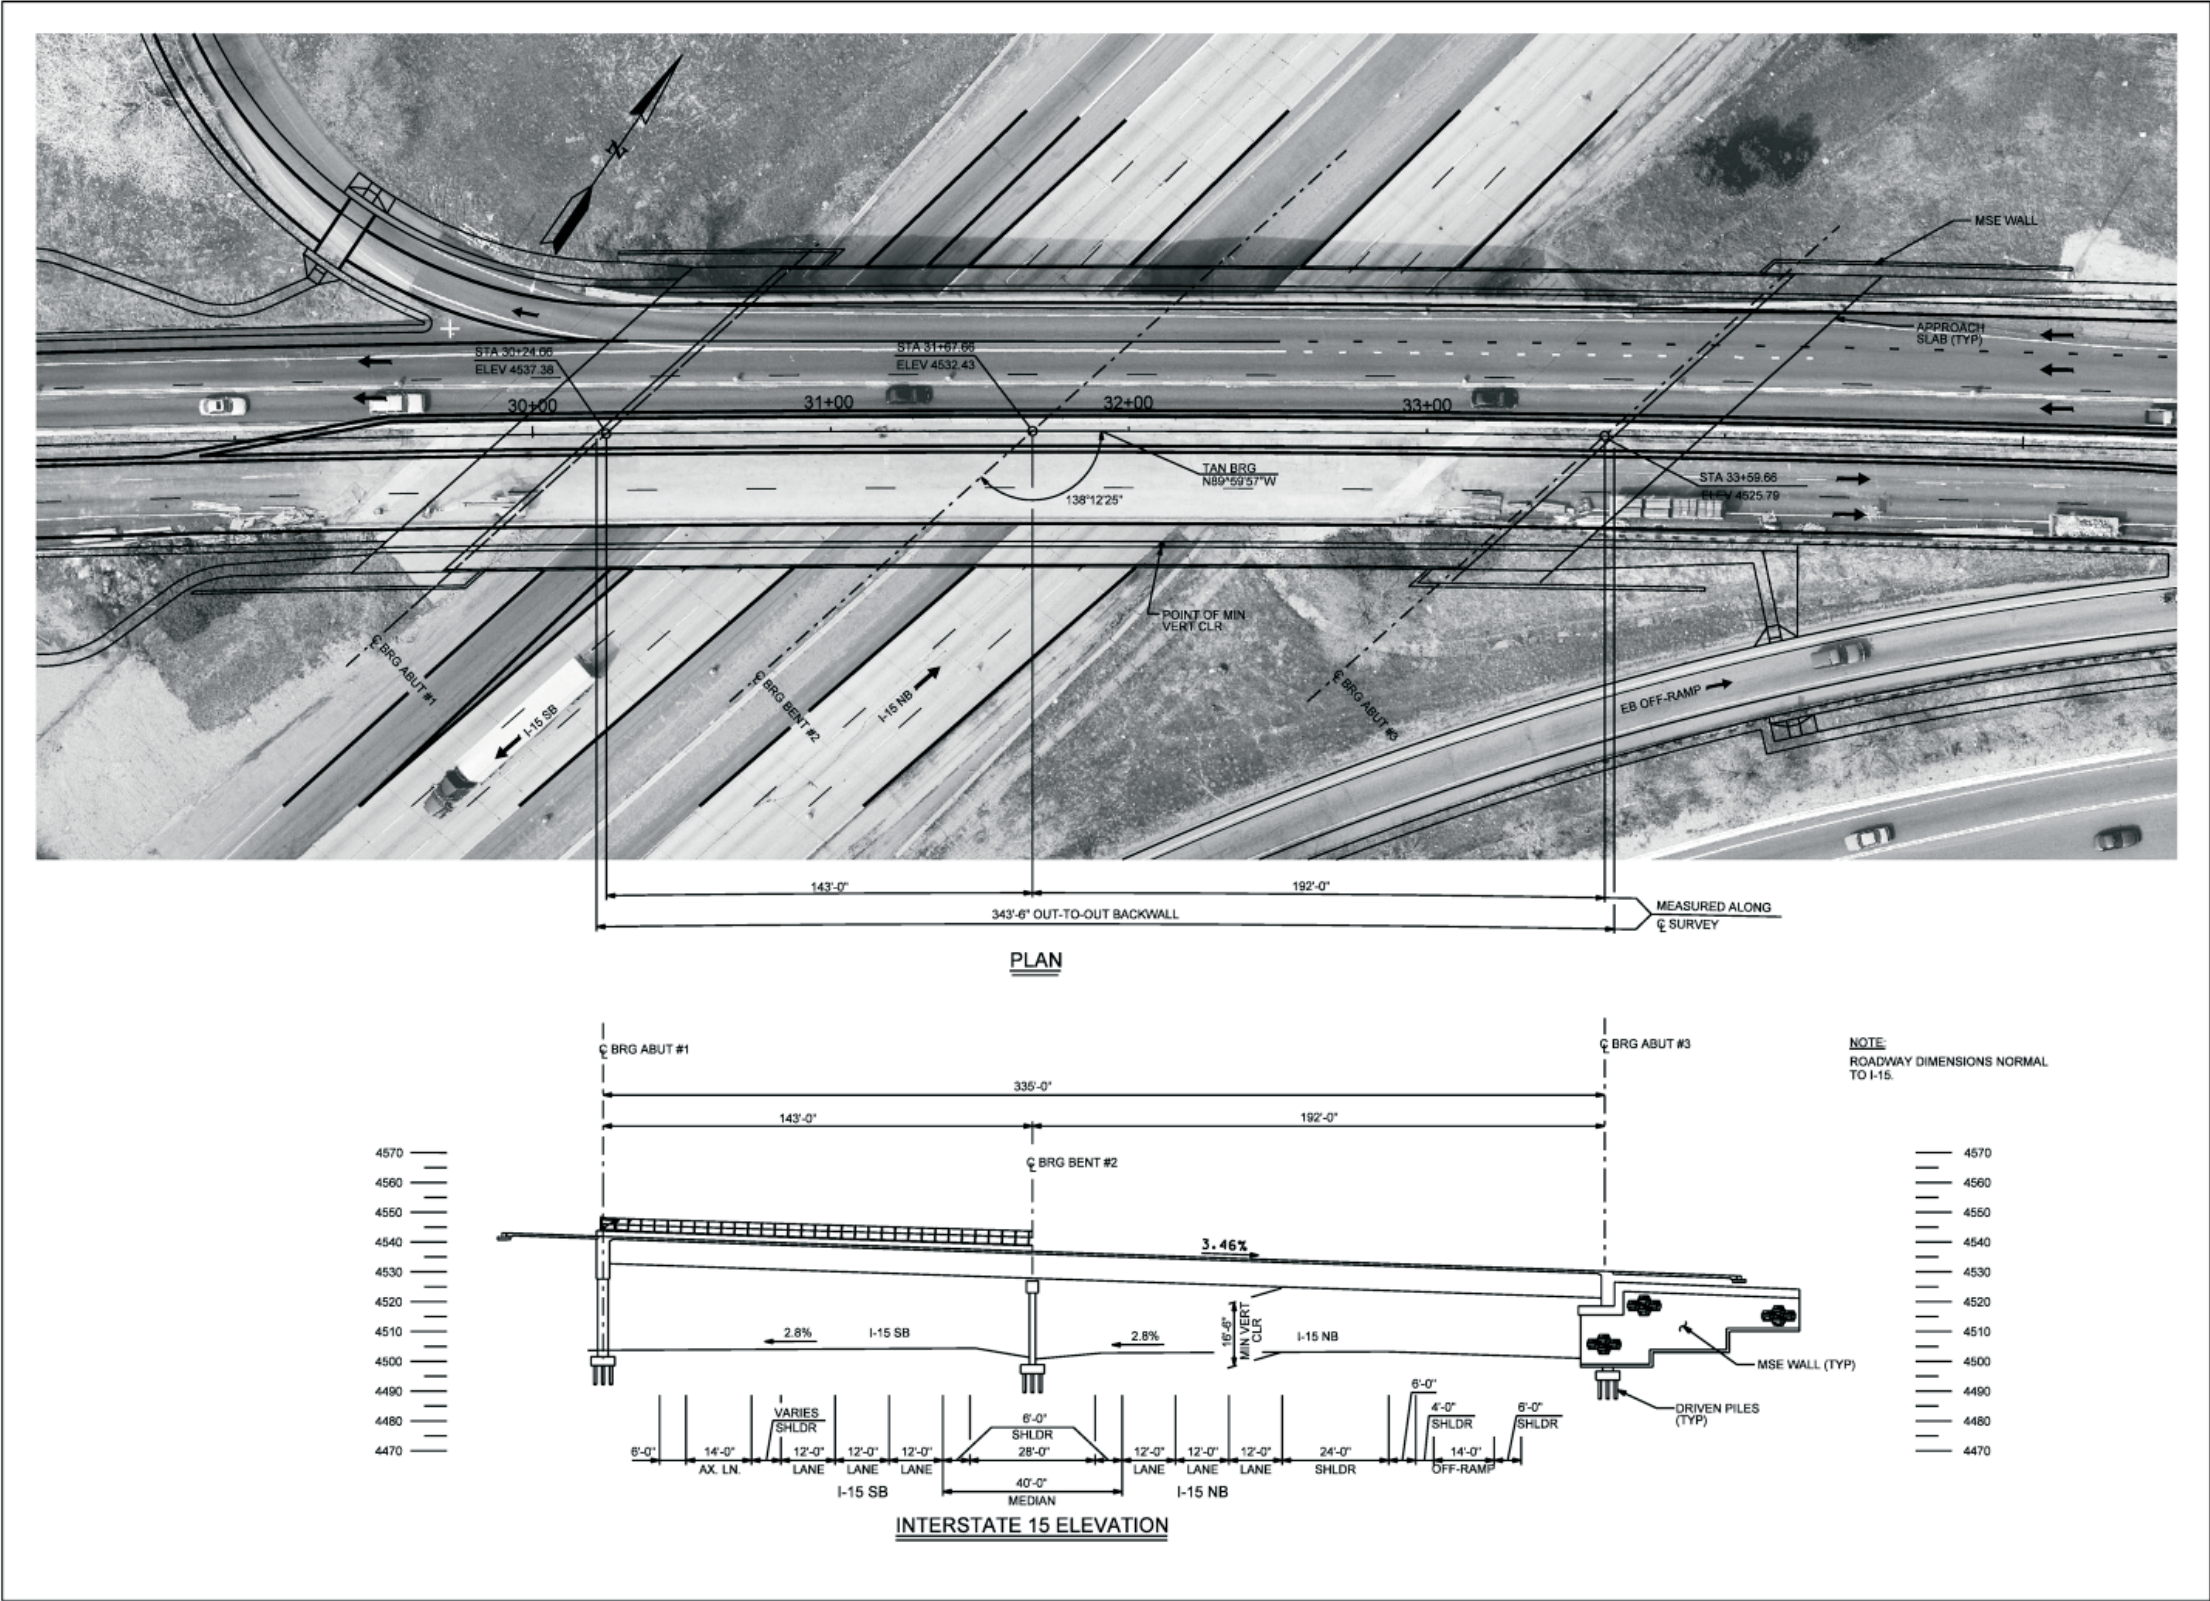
Preliminary Layout of I-15 Bridge (Page 1 of 2).
